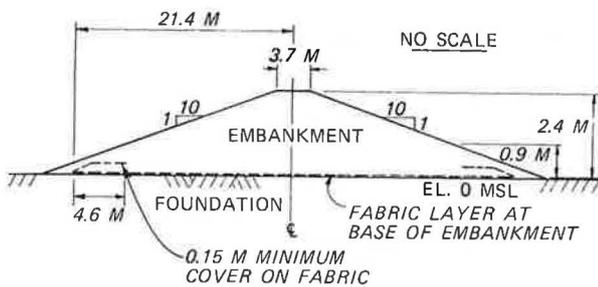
Simplified fabric-reinforced embankment section at Pinto Pass.
